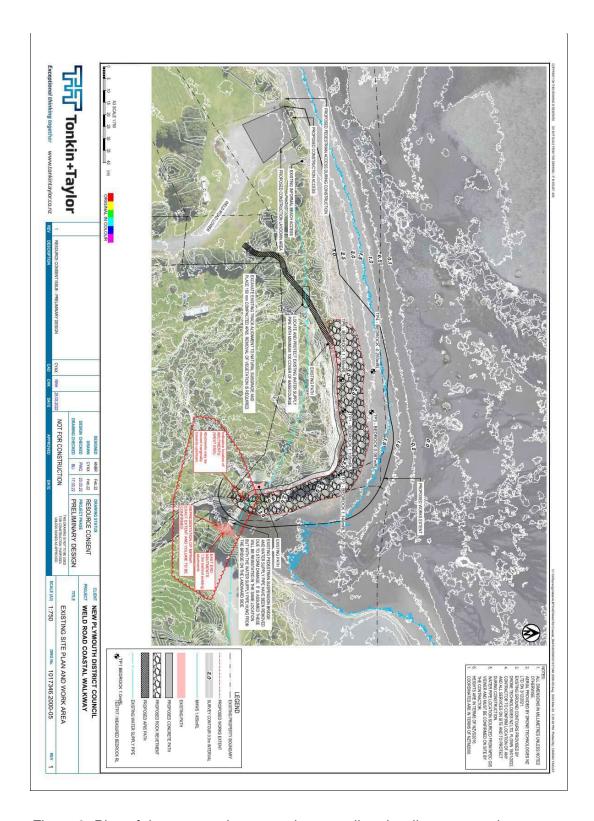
Plan of the proposed western rip-rap wall and walkway extension.
